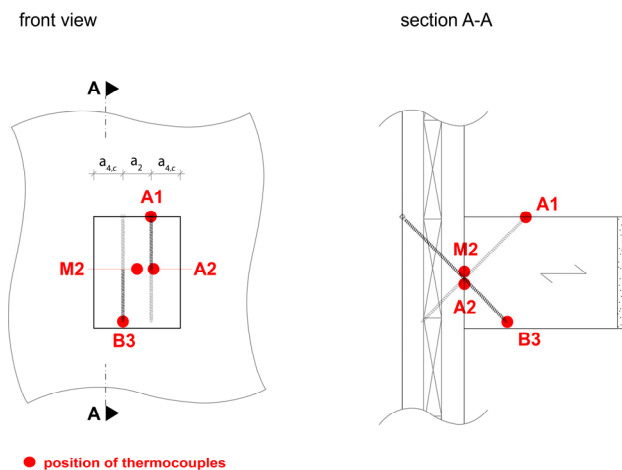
crosswise installed full thread screws and position of thermocouples in the connection
